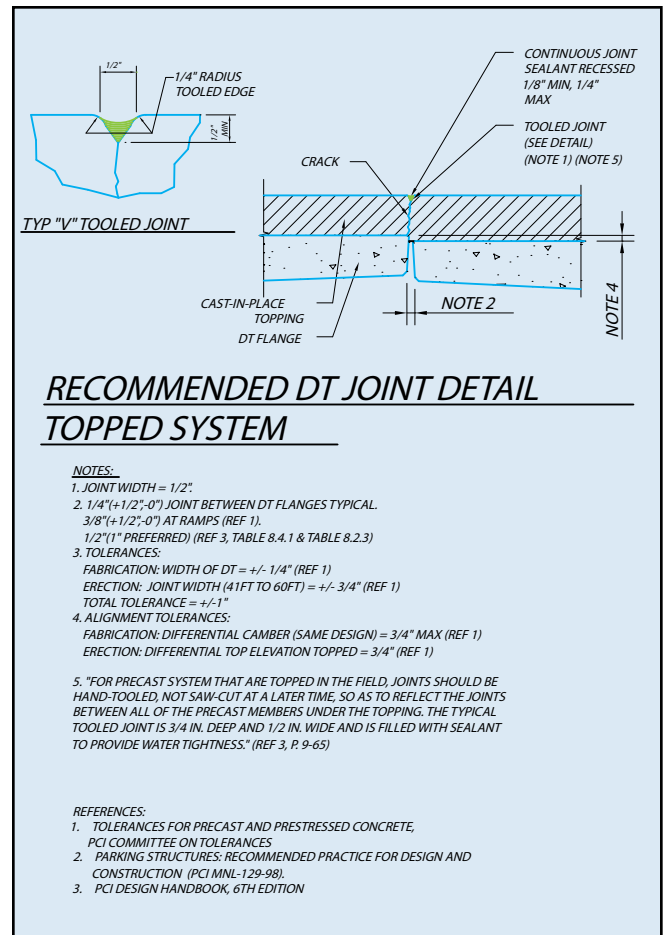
Recommended double-tee joint detail topped system. Note: " = in.; 1 in. = 25.4 mm.
